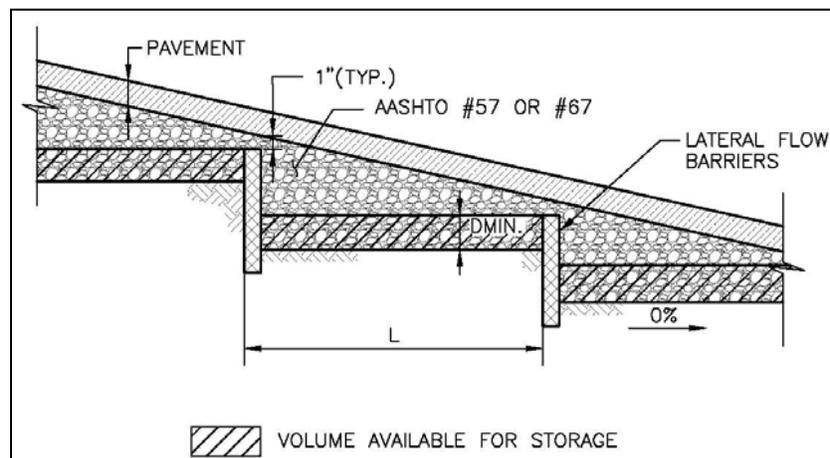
Terraced subgrade under permeable/pervious pavement (Source: UDFCD, 2013).
